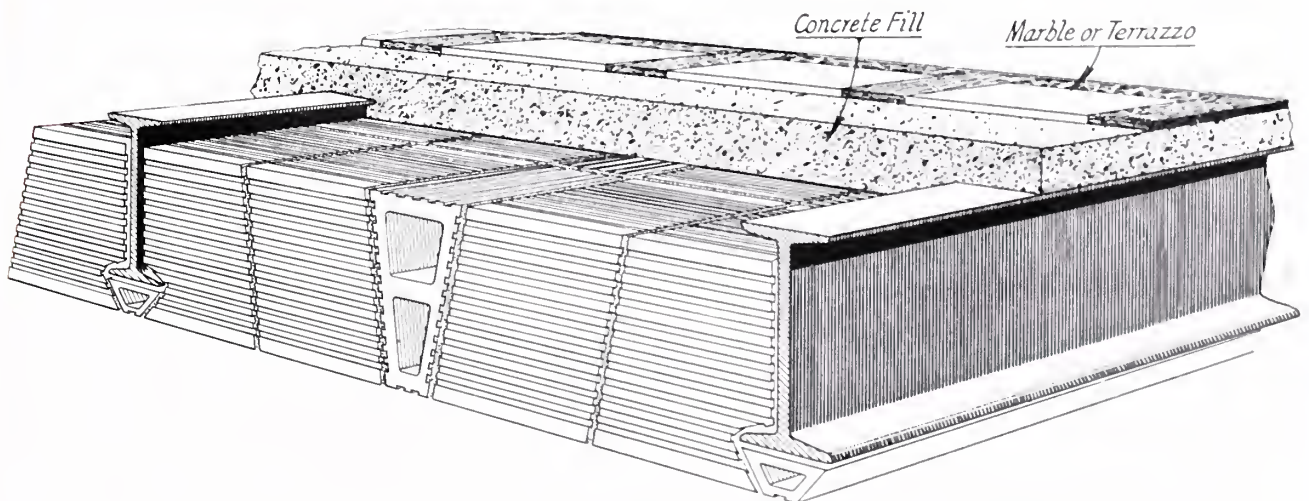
Section of End Construction Flat Arch with end construction skews and with marble or terrazzo finish, illustrating placing of units and method of making concrete fill.
